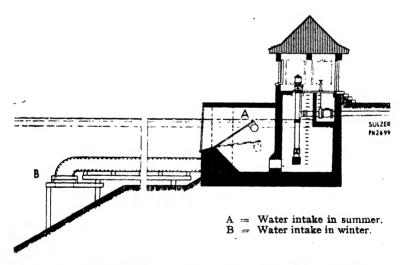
Sectional drawing of the pumping works of the Heat Pump plant installed by the Steckborn Kunstseide A.G. at Steckborn, Switzerland
